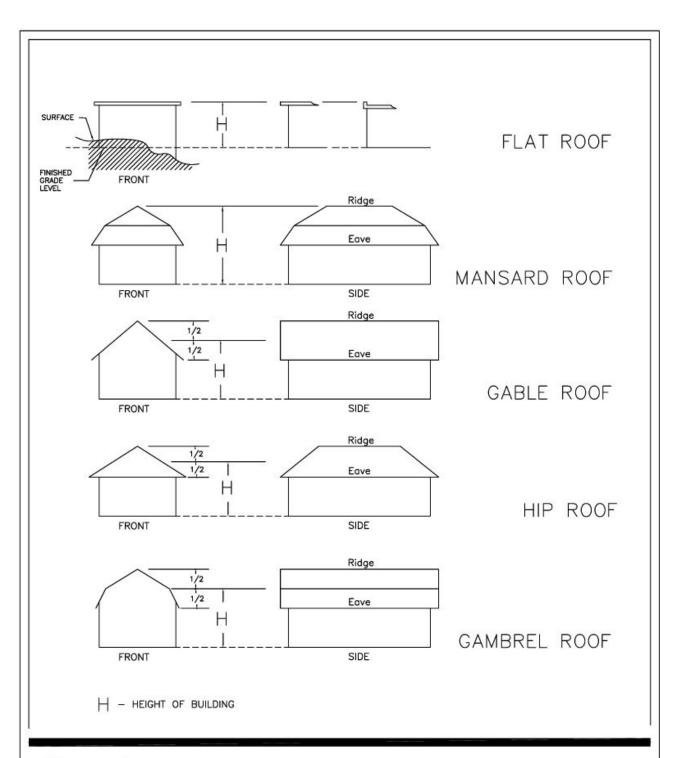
Illustration of BUILDING HEIGHT DEFINITIONS
